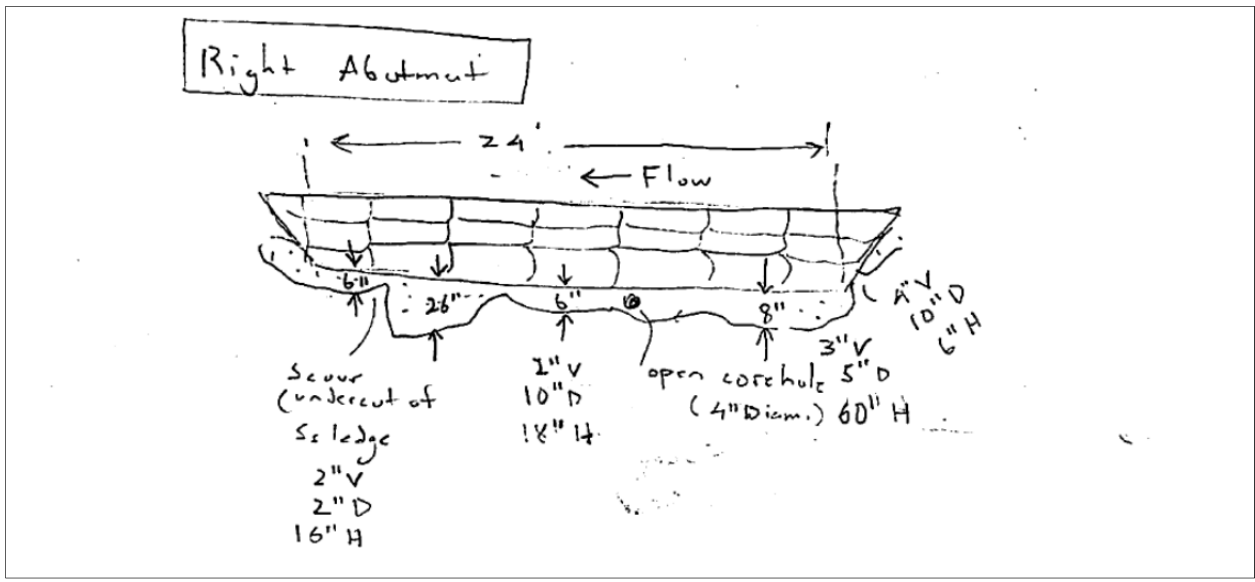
Field sketch of Laurel Fork Bridge, looking at right abutment.
